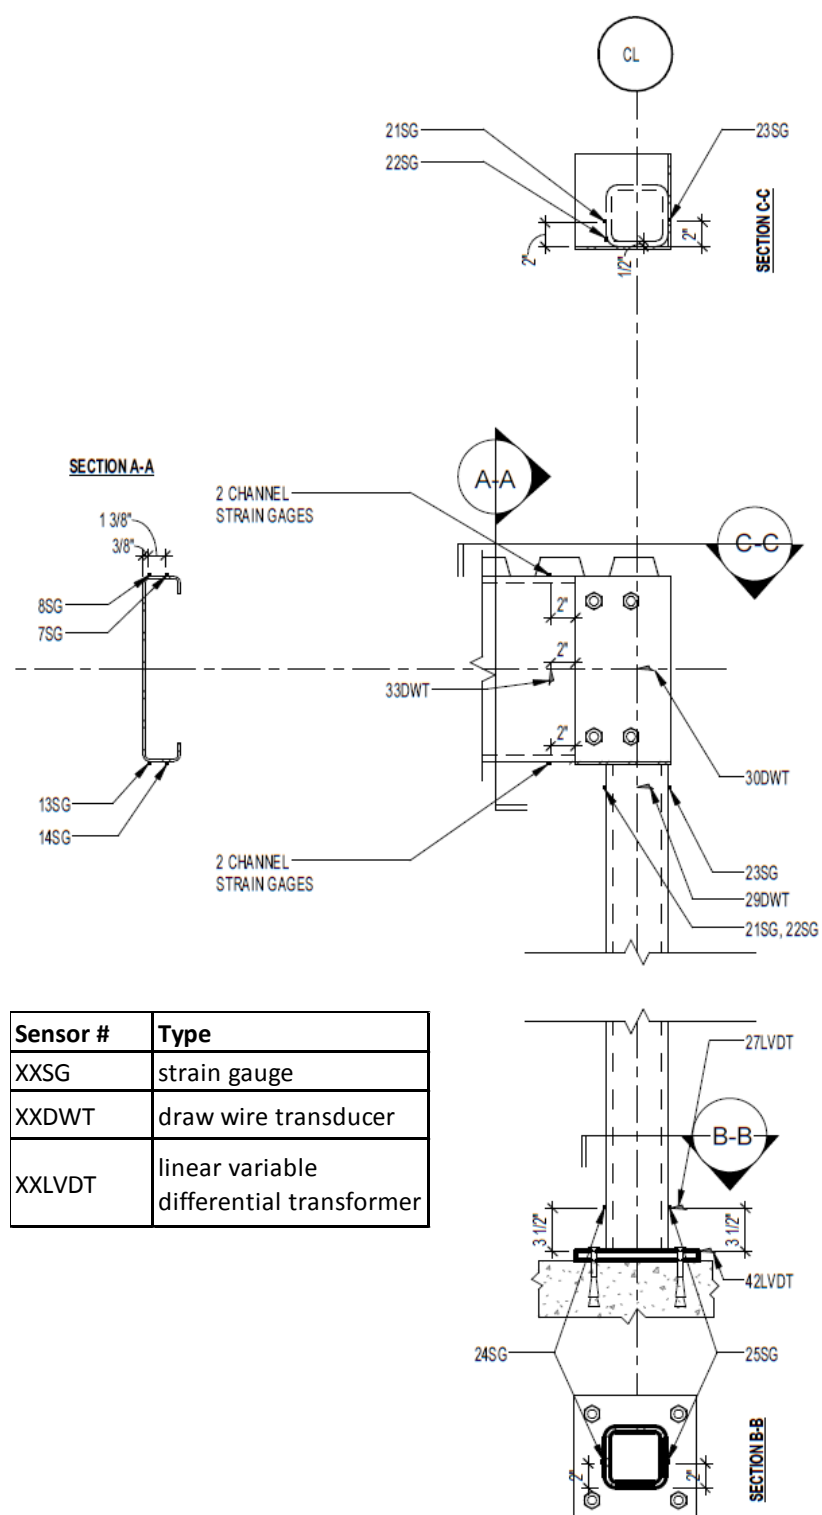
COLUMN C3NW INSTRUMENTATION
